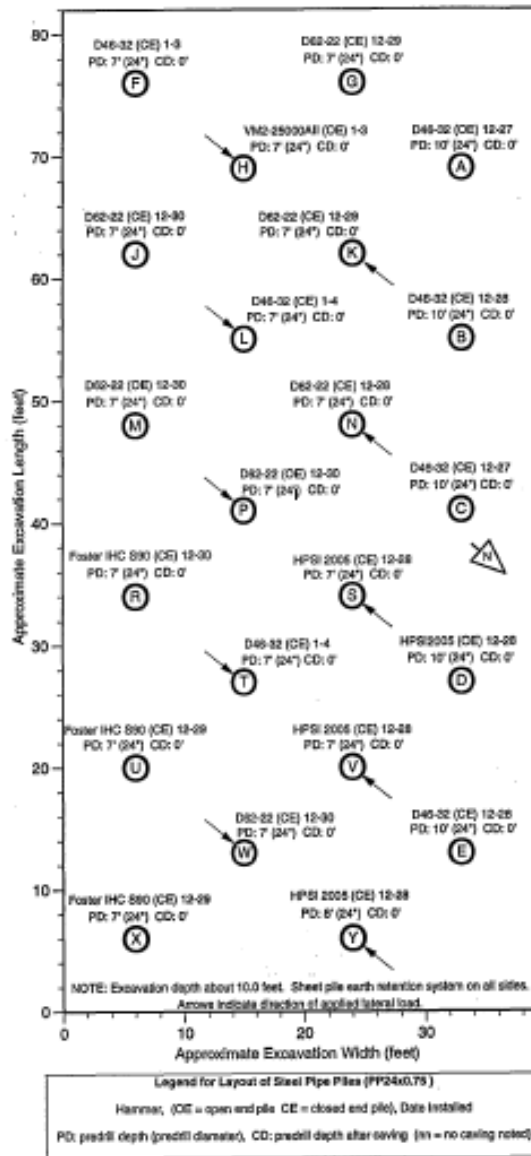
Plan View of Test Pile Layout- Site 2 (Lemke, 1997)
